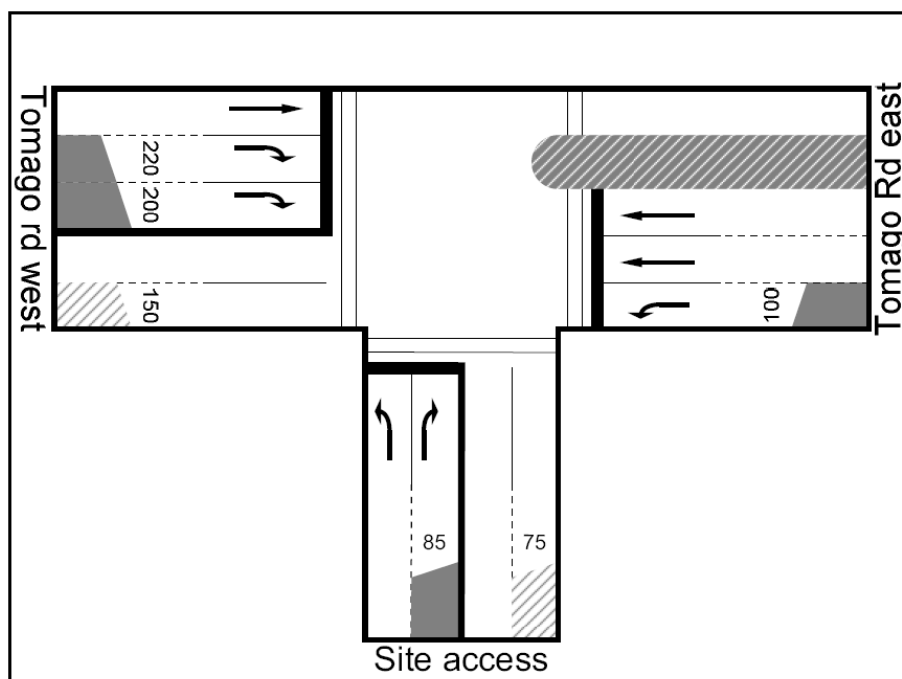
Proposed Conceptual Design of the Site Access – Stage 3
